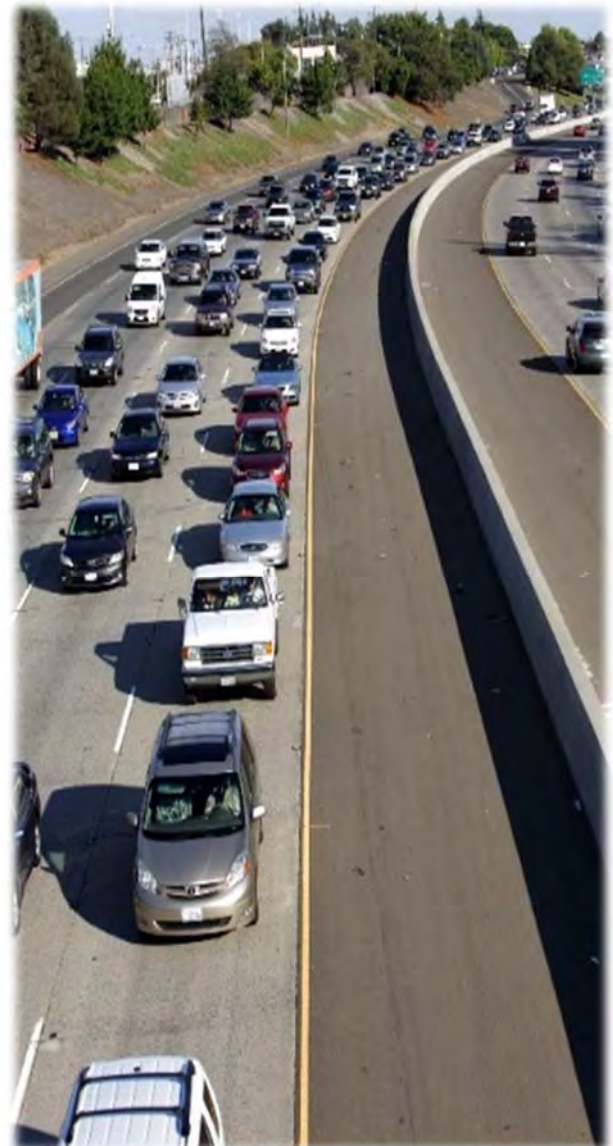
Future HOV Lane The asphalt concrete HOV lane structural section was constructed under the 2008 SHOPP project (EA-1E040). The existing shoulder will be converted from 17 ft to 8 ft. The existing # 1 & 2 lane widths will be reduced from 12 ft to 11 ft. The proposed HOV lane is also 11 ft.
